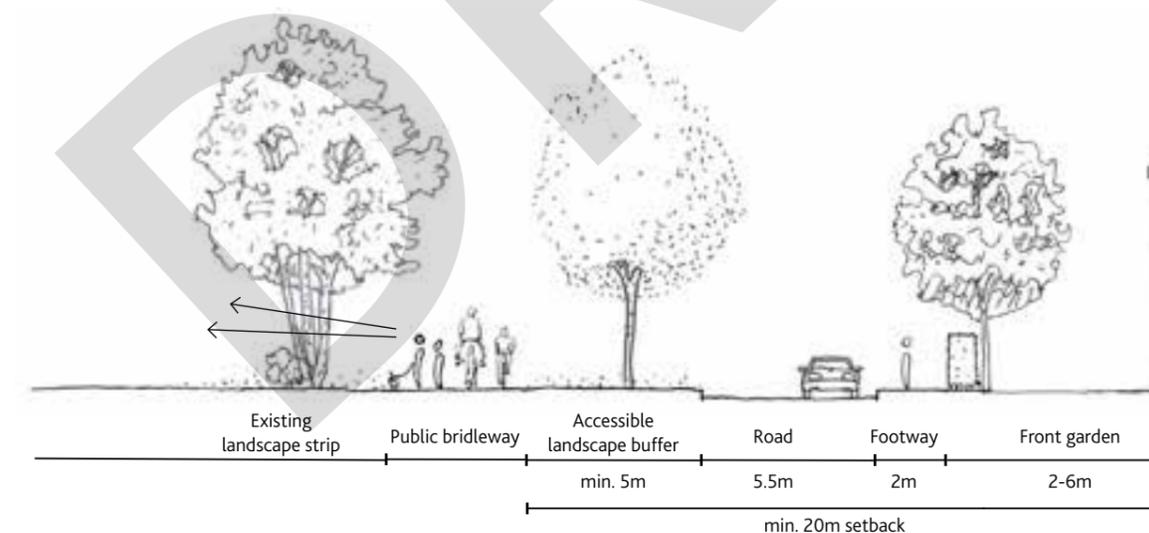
Typical street section 11 - typical street section in Rural Fringe area.
